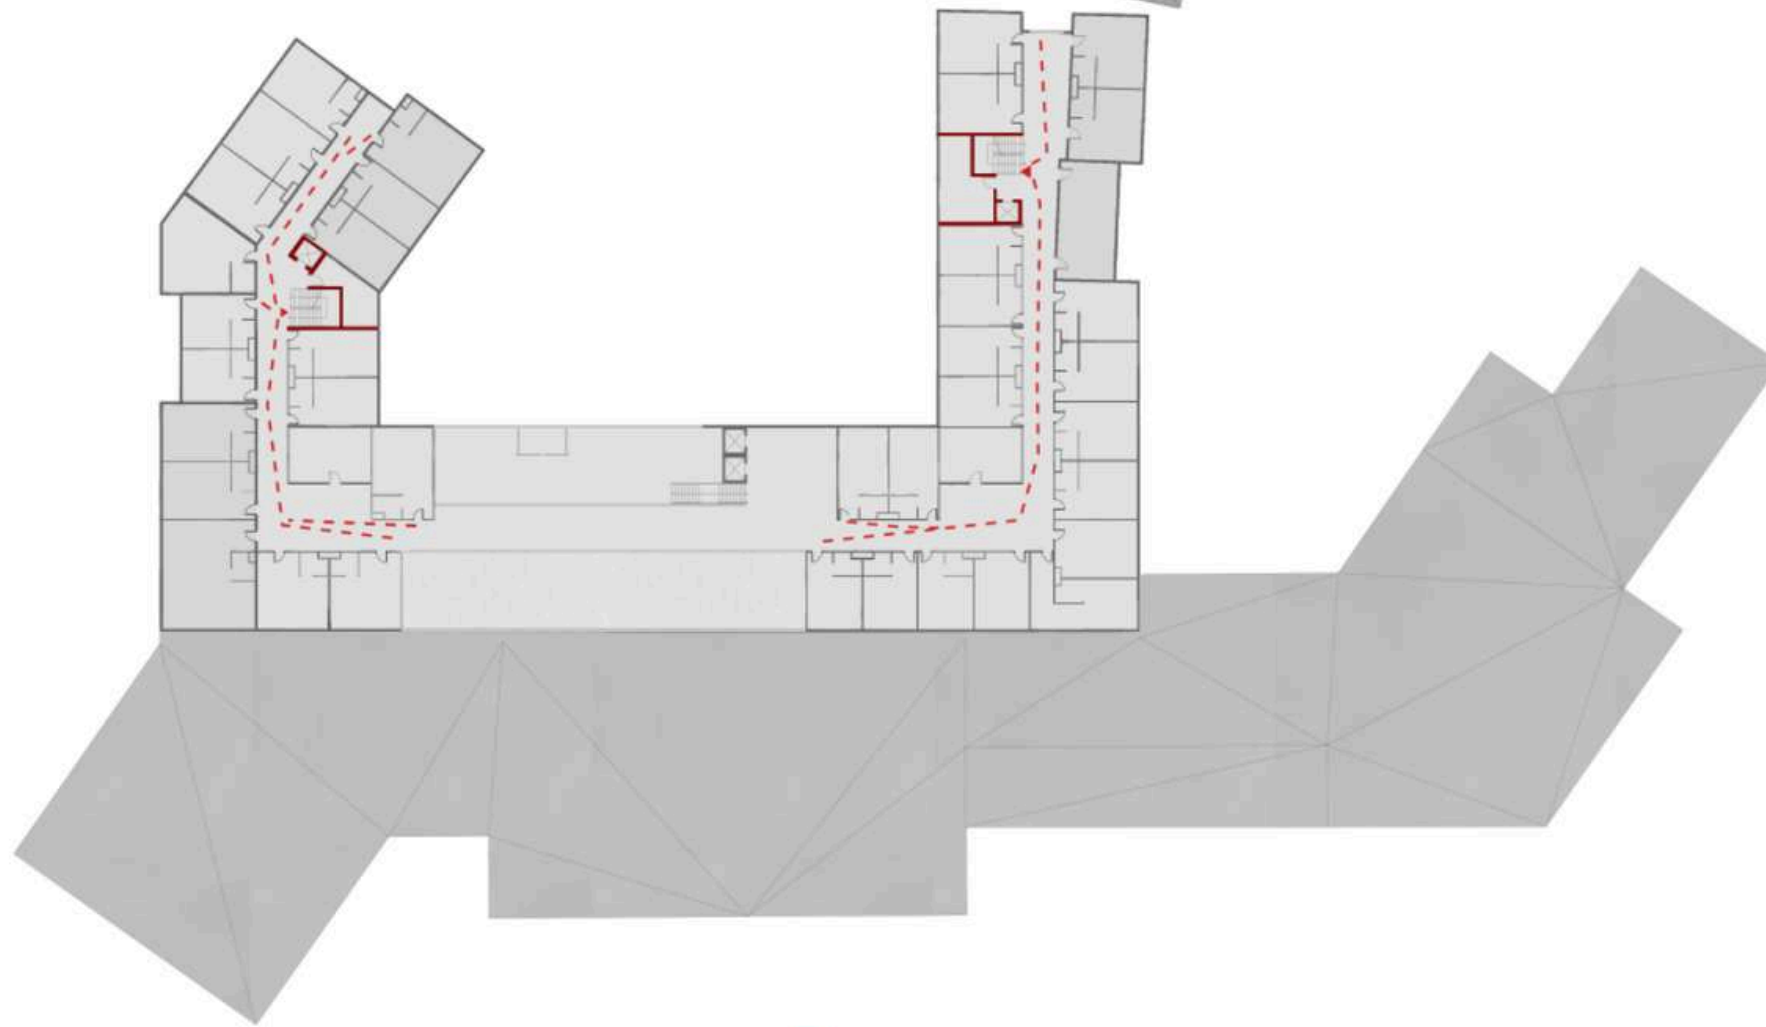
CORRIDOR PARTITION WALL (EI60)
